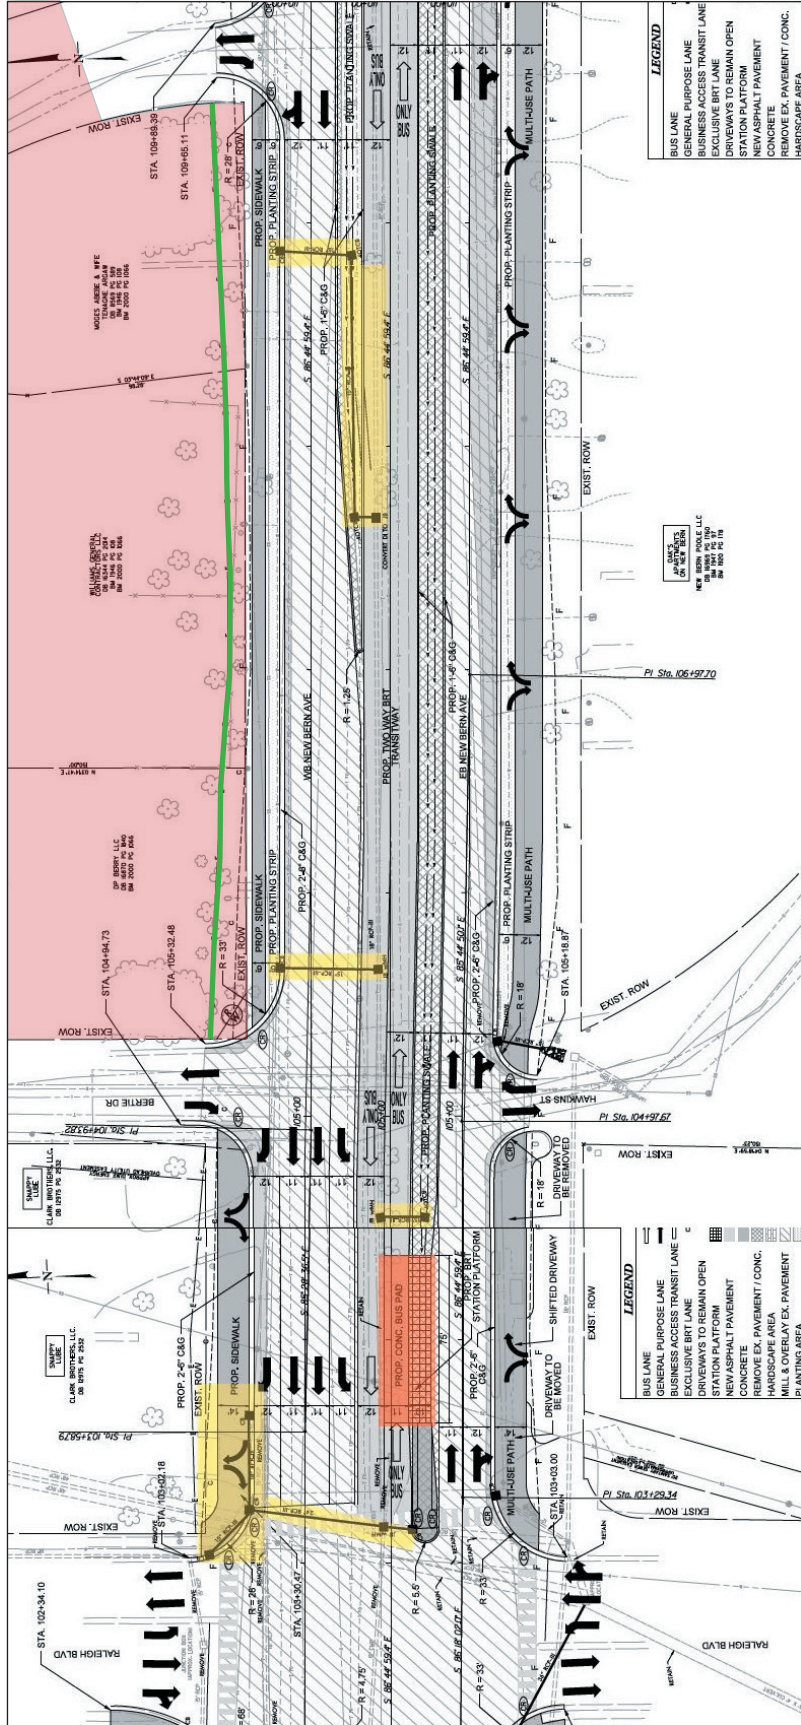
Temporary Construction Easement (green) and the New Bern Avenue Improvements, Wake BRT New Bern Corridor Preliminary Plans, Sheet R-NBN-024, 2020
